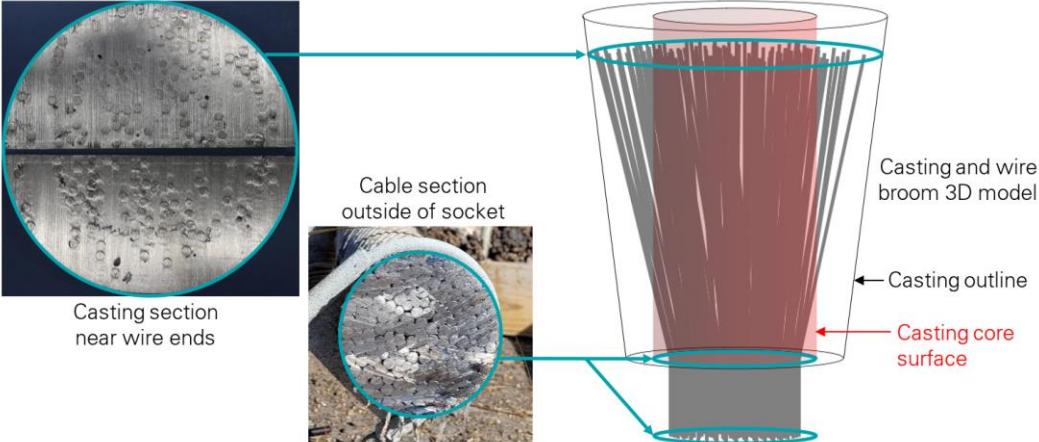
Construction of broom geometry from cable and casting sections (casting section photo: Socotec).
